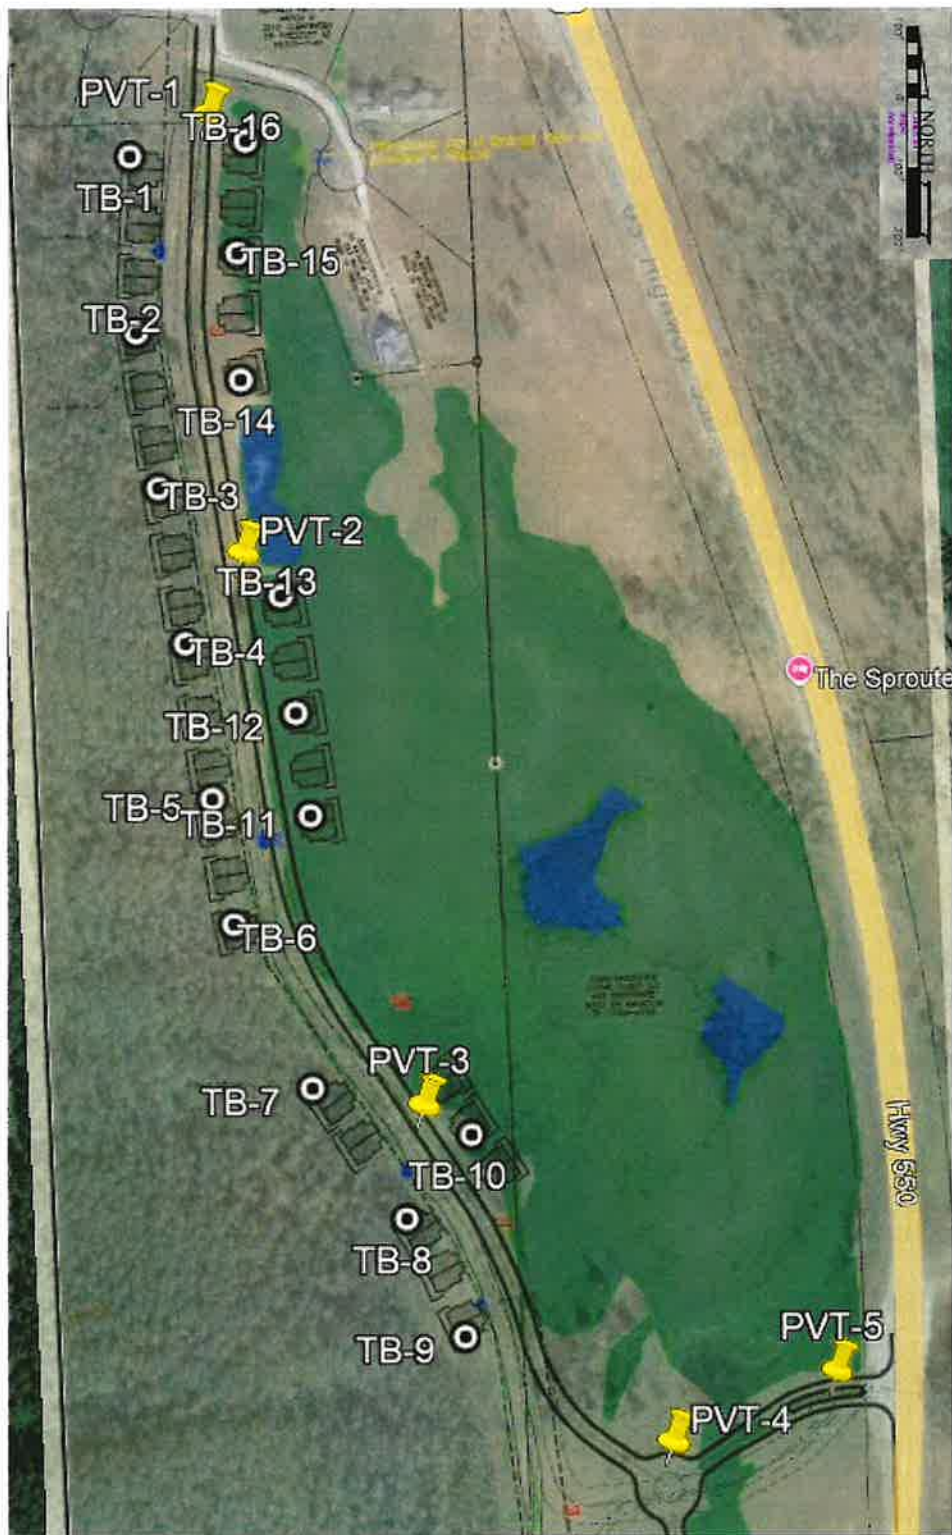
Locations of Exploratory Borings. Adapted from a site plan prepared by CHC Engineers LLC.
